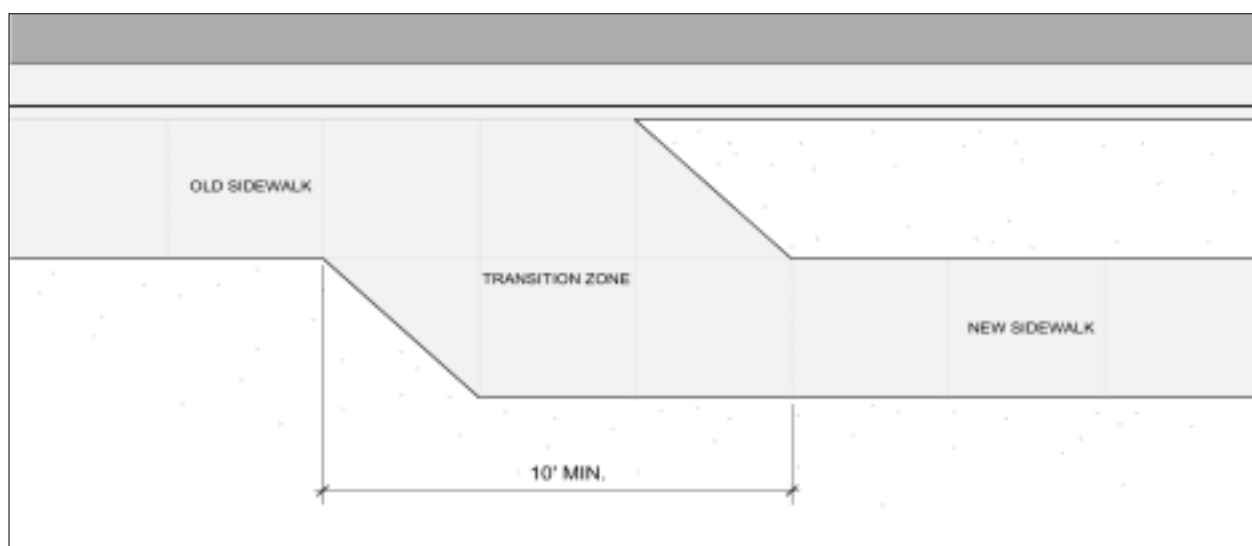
A transition zone is necessary when a new sidewalk and an old sidewalk meet mid-block.
